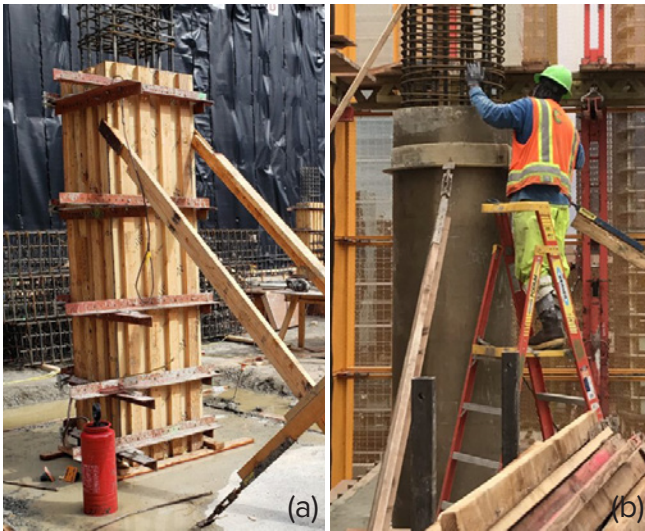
Examples of concrete column forms: (a) rectangular; and (b) round. (Images courtesy of Conco.)
